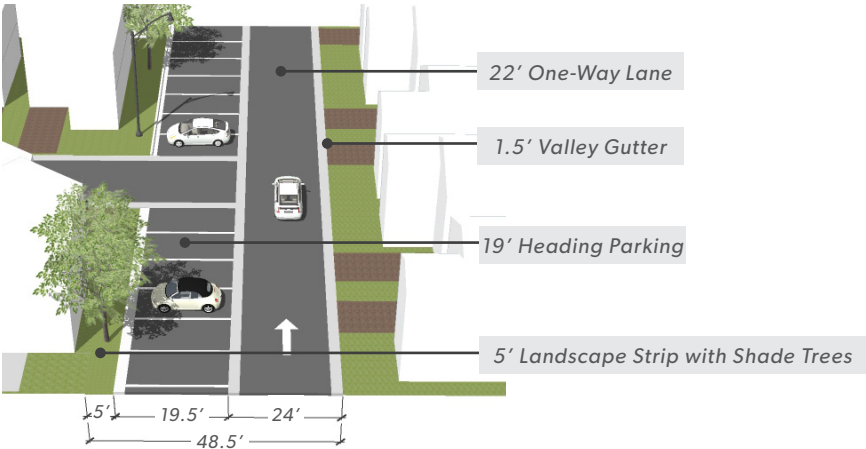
ALLEY TYPE "A" TYPICAL SECTION
